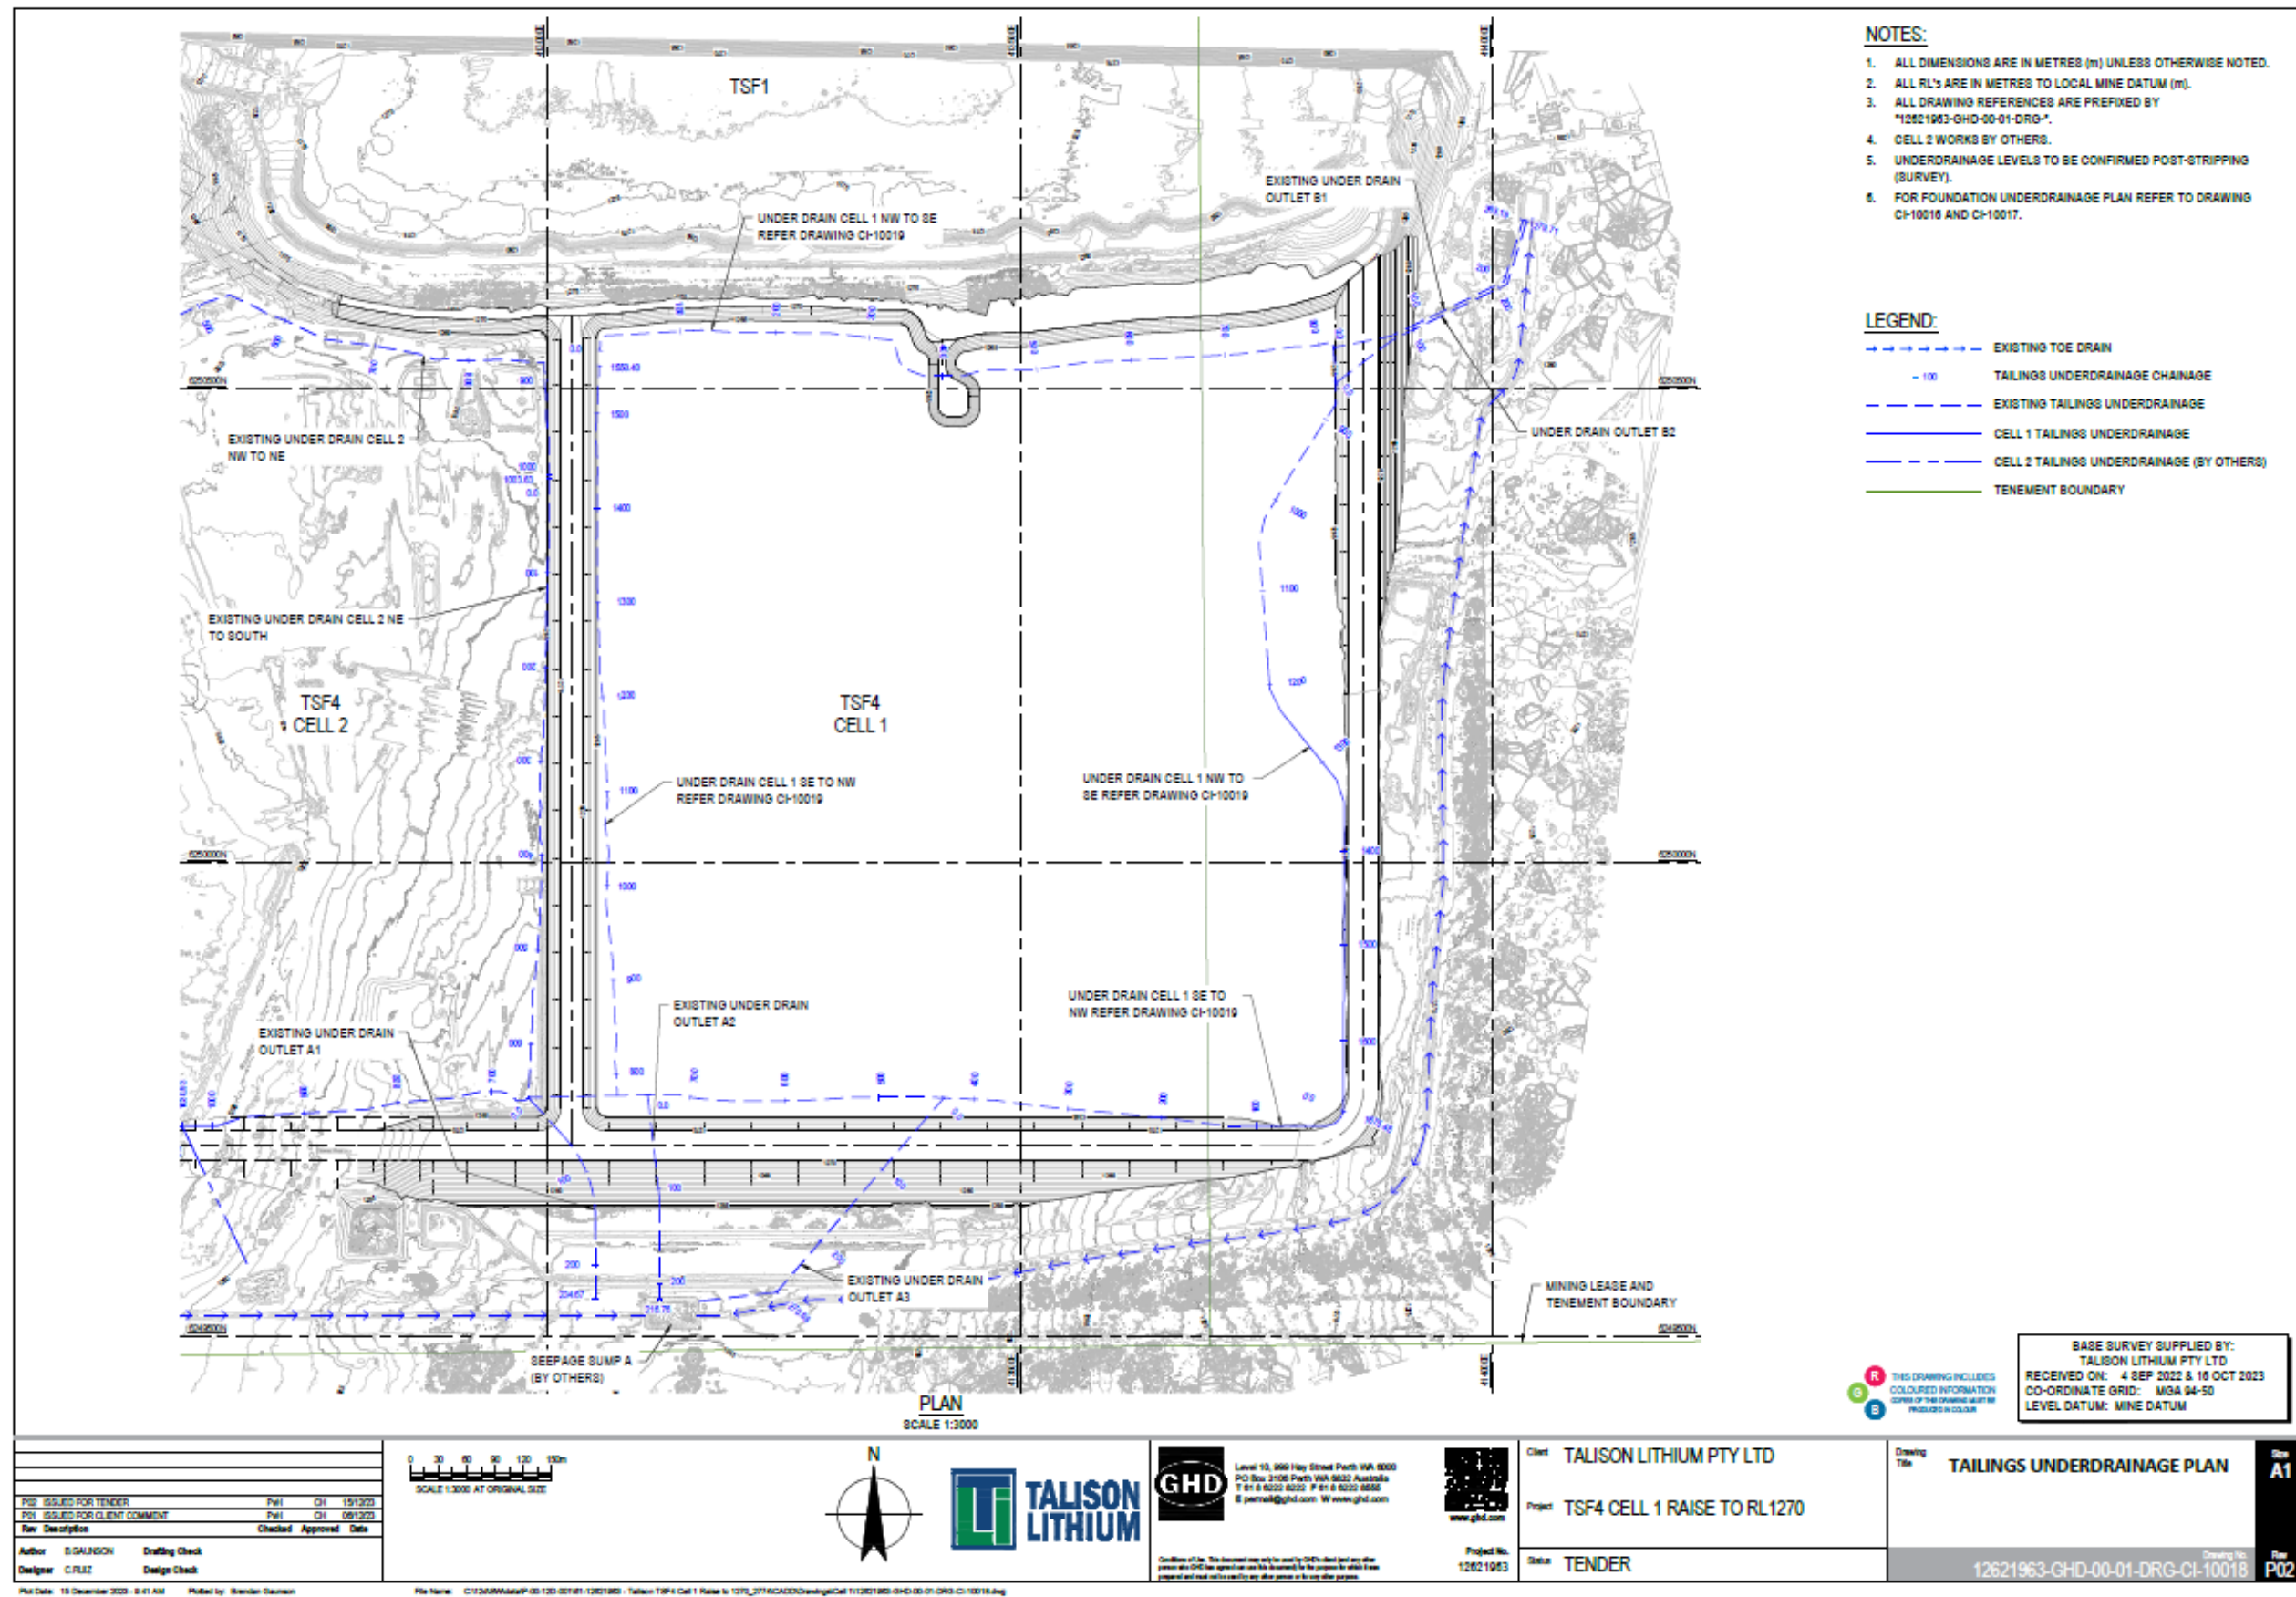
TSF4 cell 1 - tailings underdrainage plan
